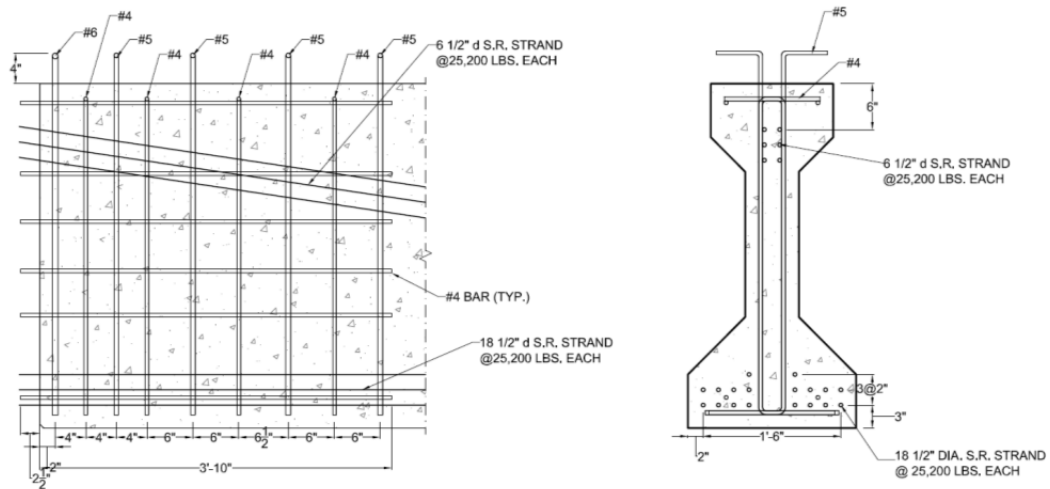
Reinforcing steel details at end of girder for Escambia Bay Bridge (from FDOT),
